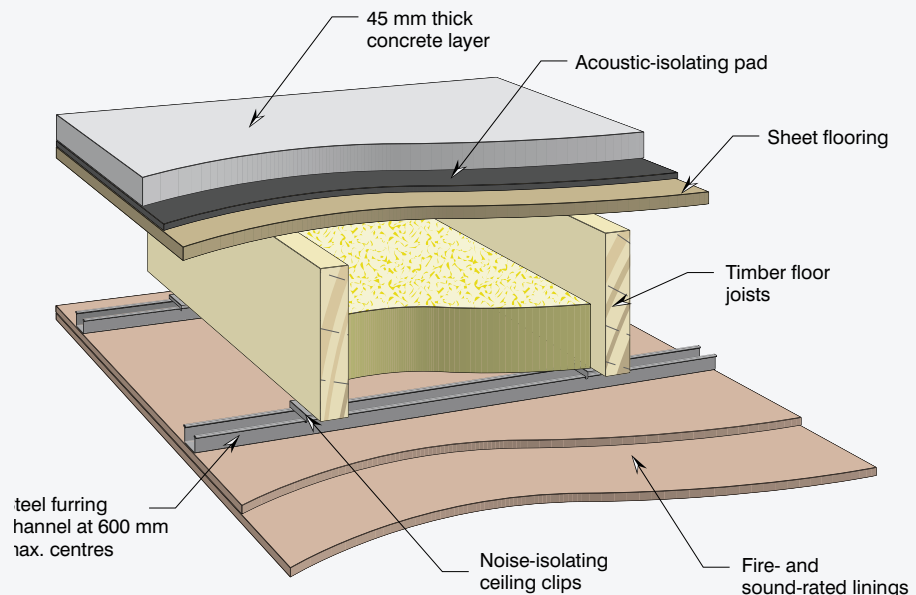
Concrete topping on the floor system with underlying resilient mat.
